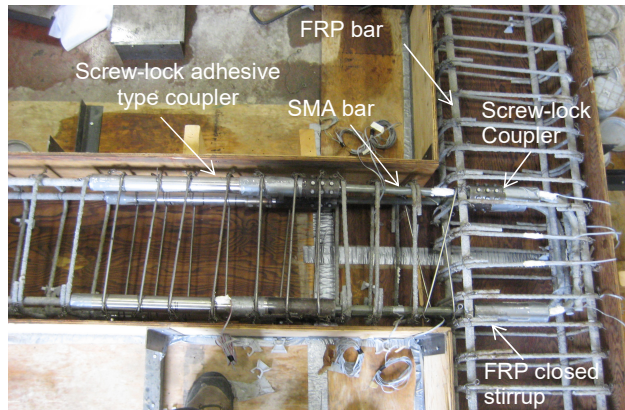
Reinforcement cage of JBC4 showing the bar and coupler arrangements inside the formwork.
